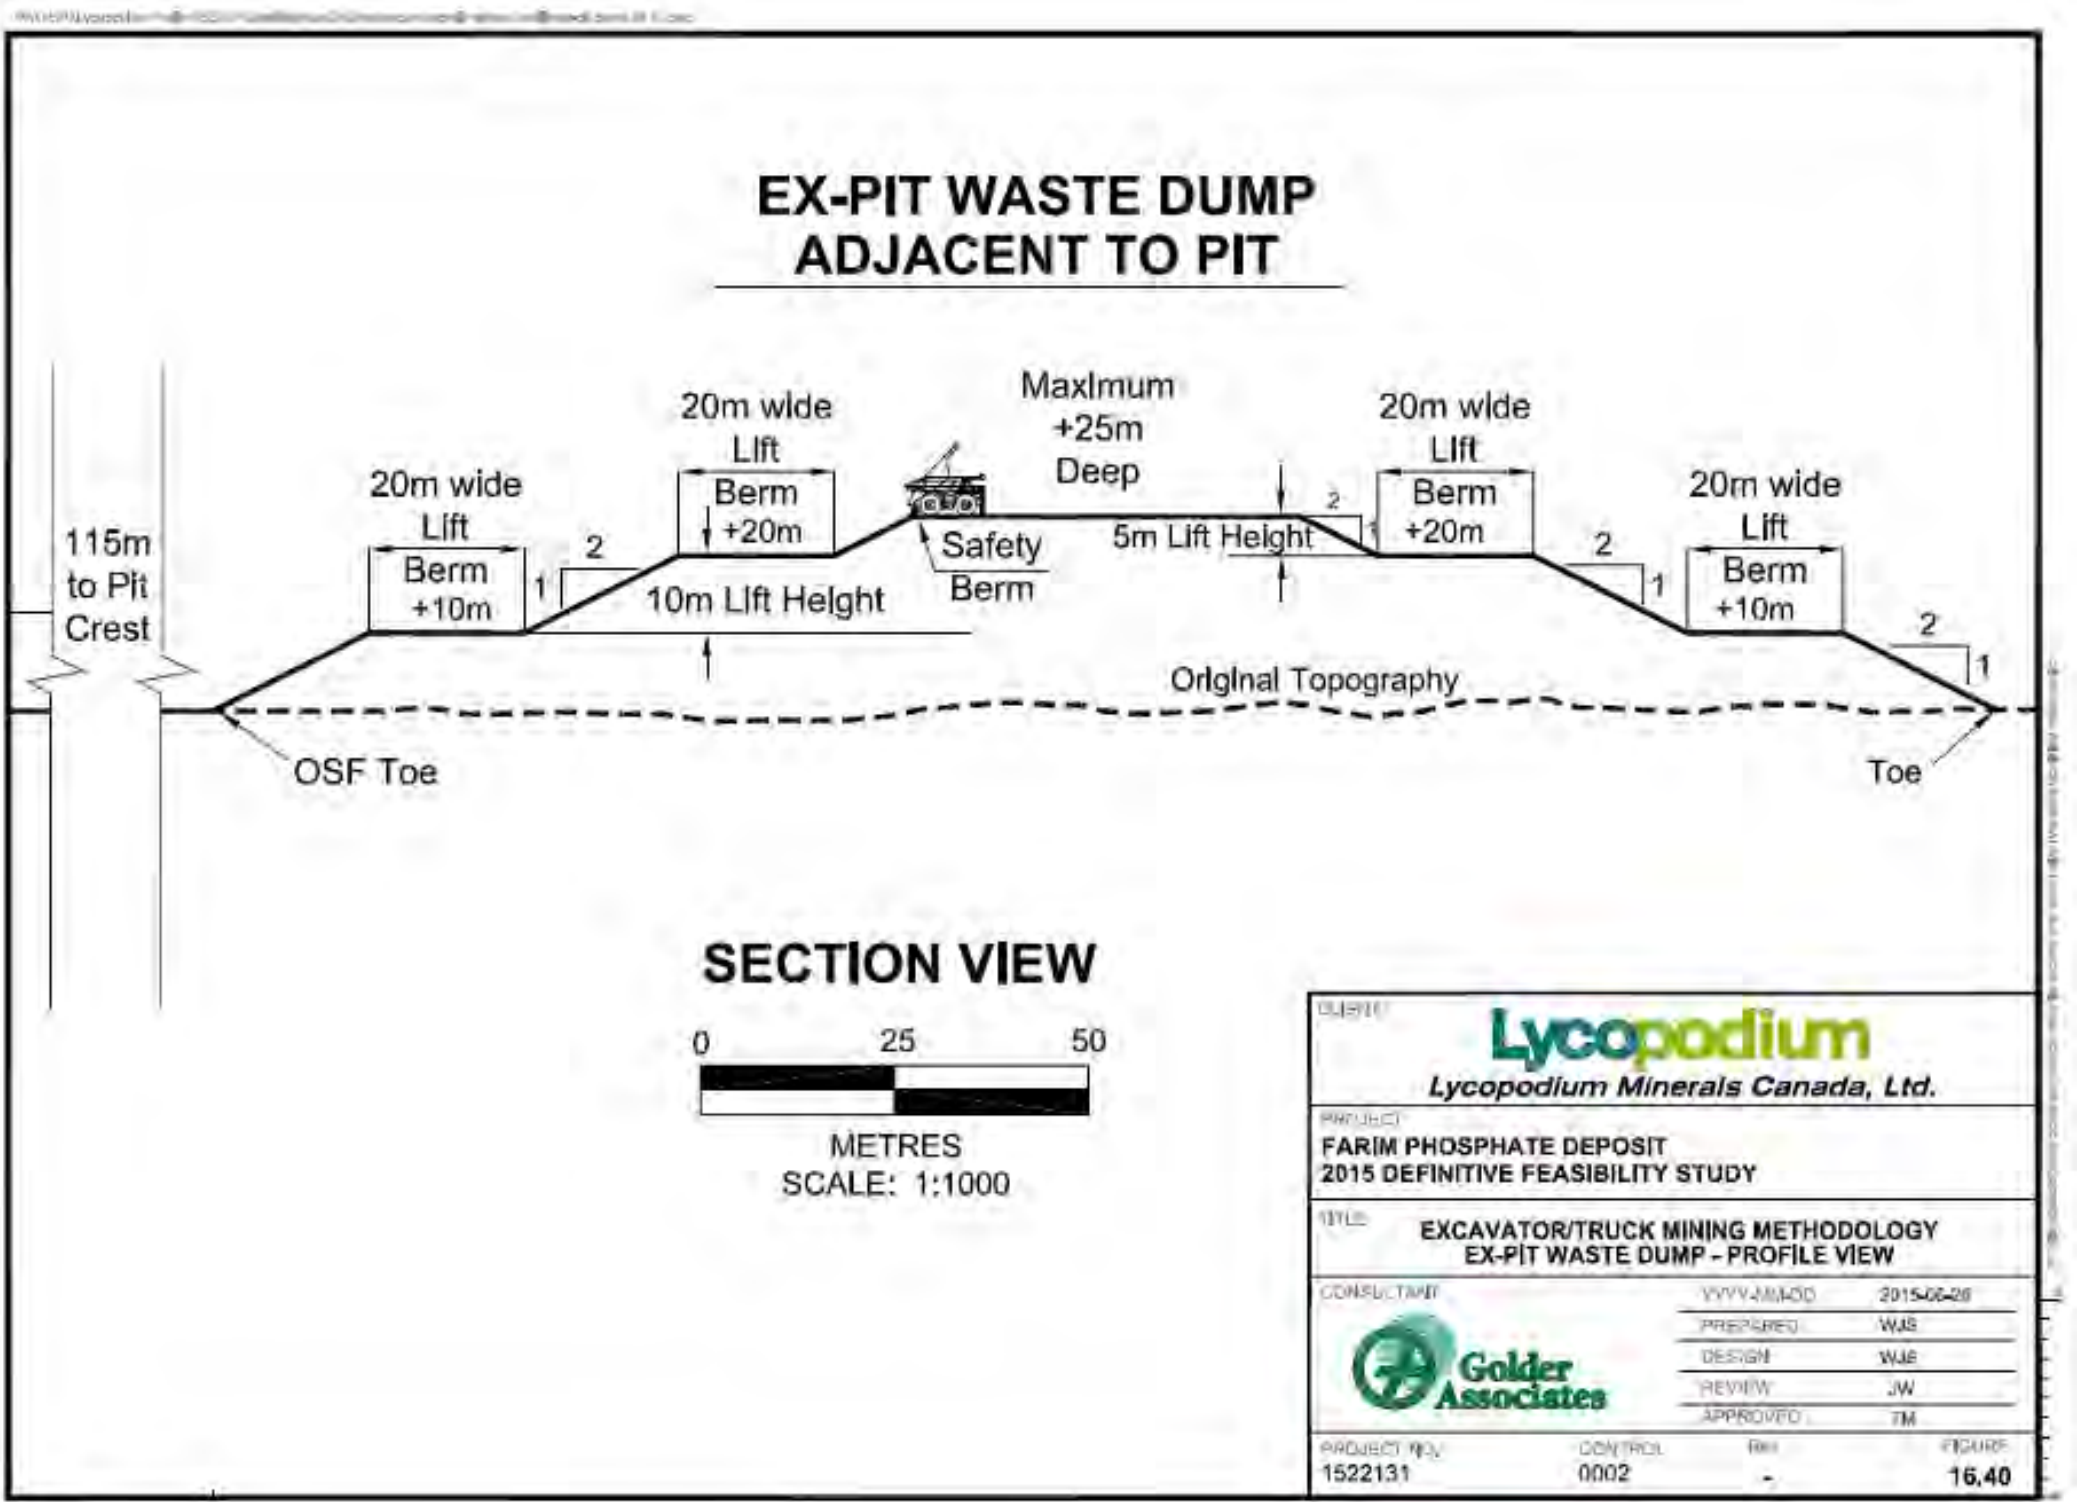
Excavator/Truck Mining Methodology Ex-Pit Waste Dump – Profile View
